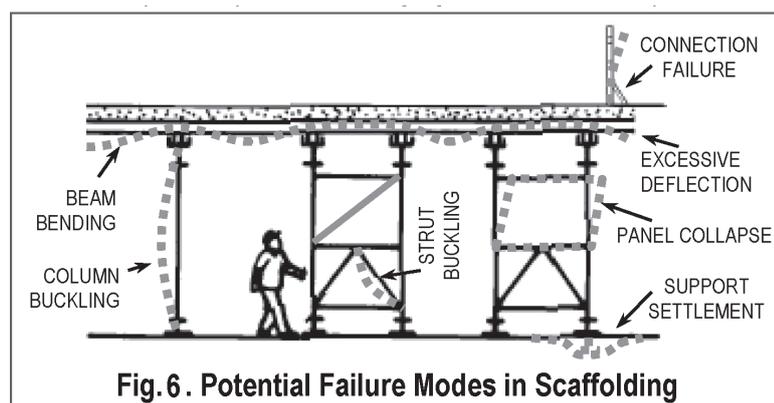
Potential Failure Modes in Scaffolding
